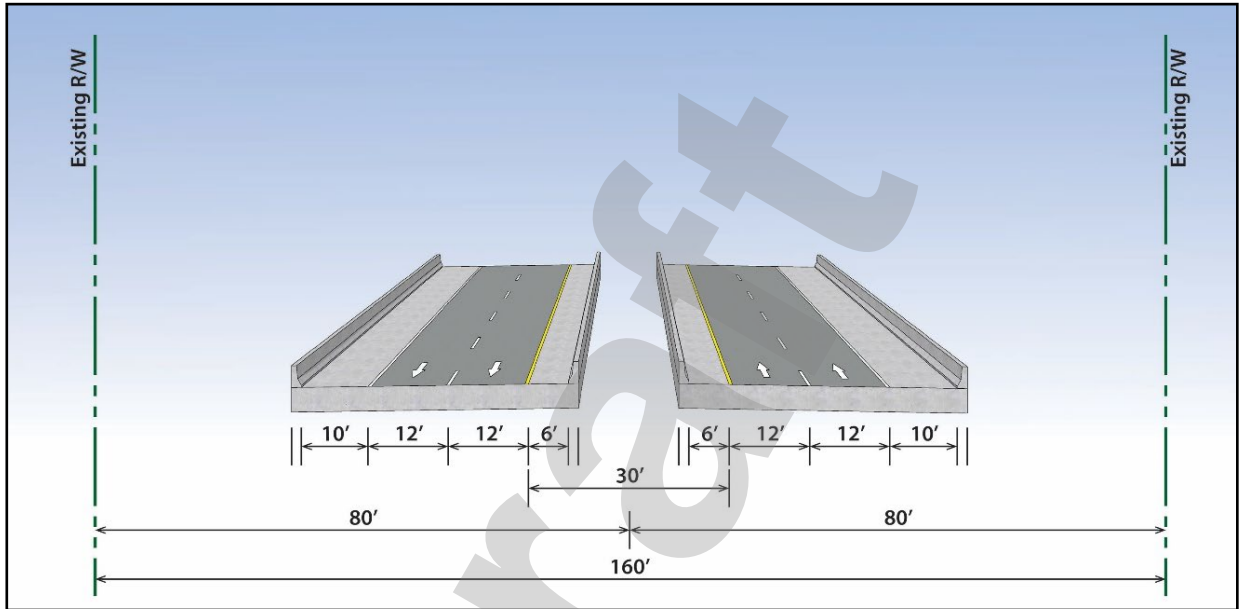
Proposed Bridge Typical Section – Hillsborough River
